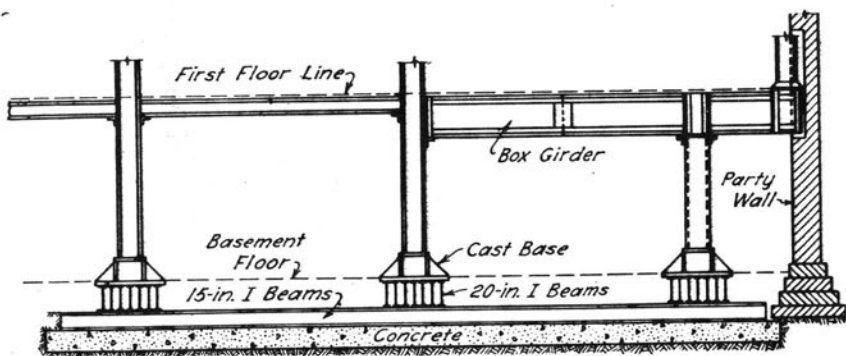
CANTILEVER FOOTING SUPPORTING SOUTH WALL OF OLD COLONY BUILDING
